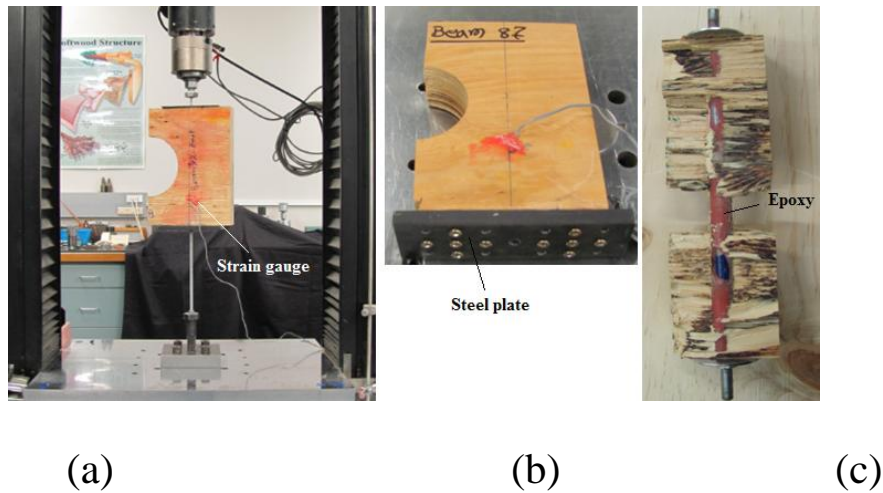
(a) Tensile test configuration for the epoxy grouted rods, (b) lower steel plate screwed to the LVL, (c) epoxy-grouted rod at the end of the test
